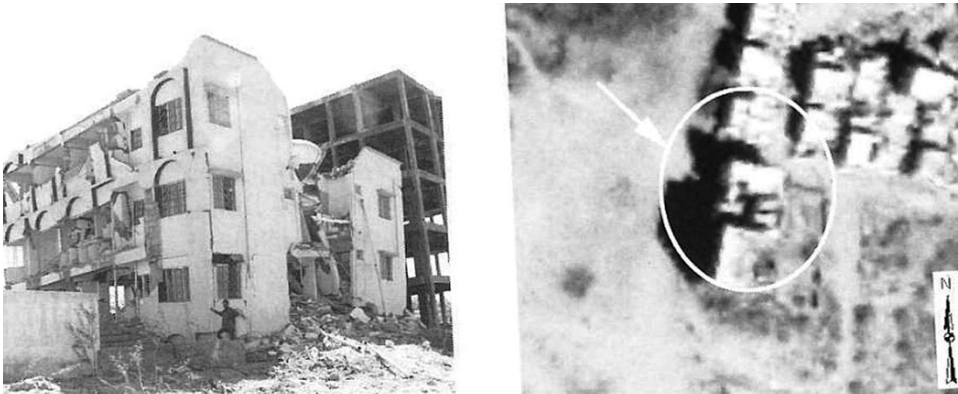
Stone masonry building in the Kutch district damaged in the Bhuj earthquake.
